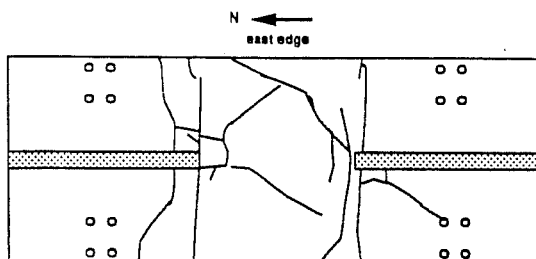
Sp. 2b: Progression of Cracking of Top Face of Second Floor Slab at End of Test
